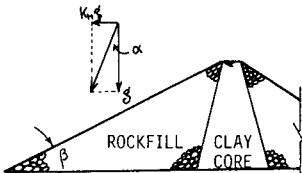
TYPICAL CROSS SECTION OF ROCKFILL DAM
